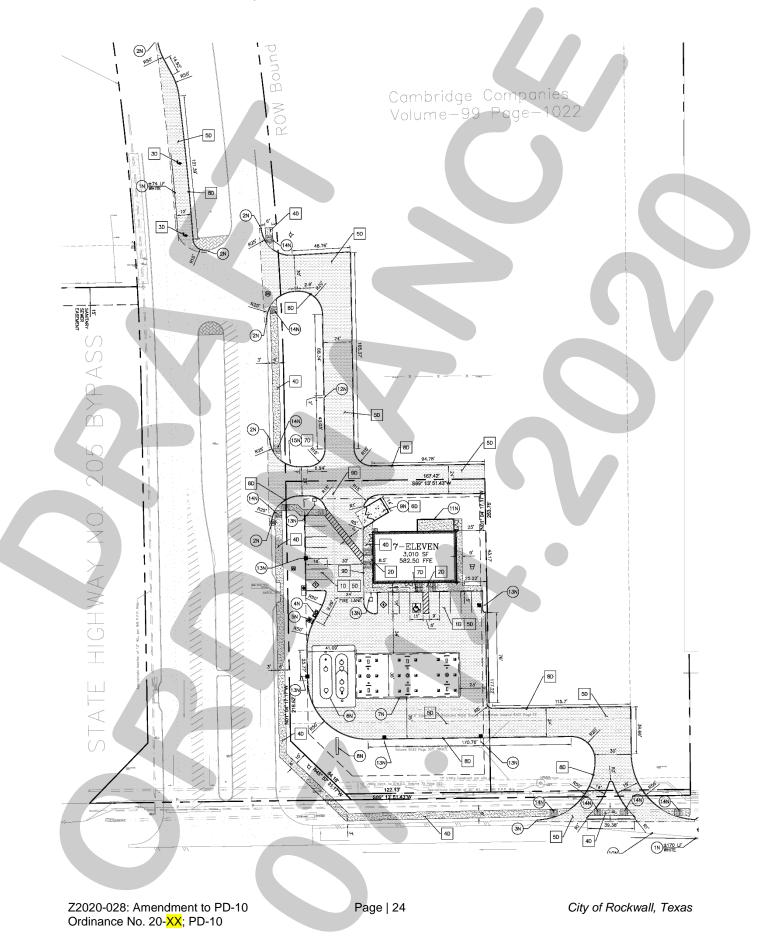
EXHIBIT 'G': Concept Plan and Elevations from Ordinance No. 12-13
